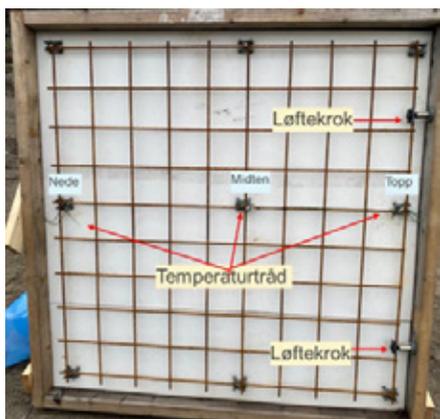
Element formwork with PE-foam at the rear side, mesh reinforcement in center, thermo-couple locations and lifting anchors. Final locations during later fire test: topp=top, midten=center, nede=bottom.
